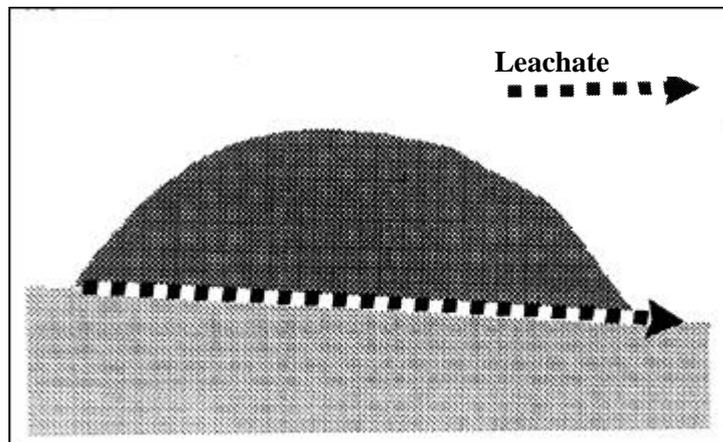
Planar landfill site on inclined area⁹⁸
